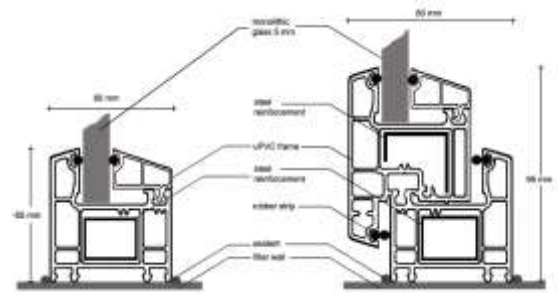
Detailed section of the uPVC frame of fixed (left) and open (right).
